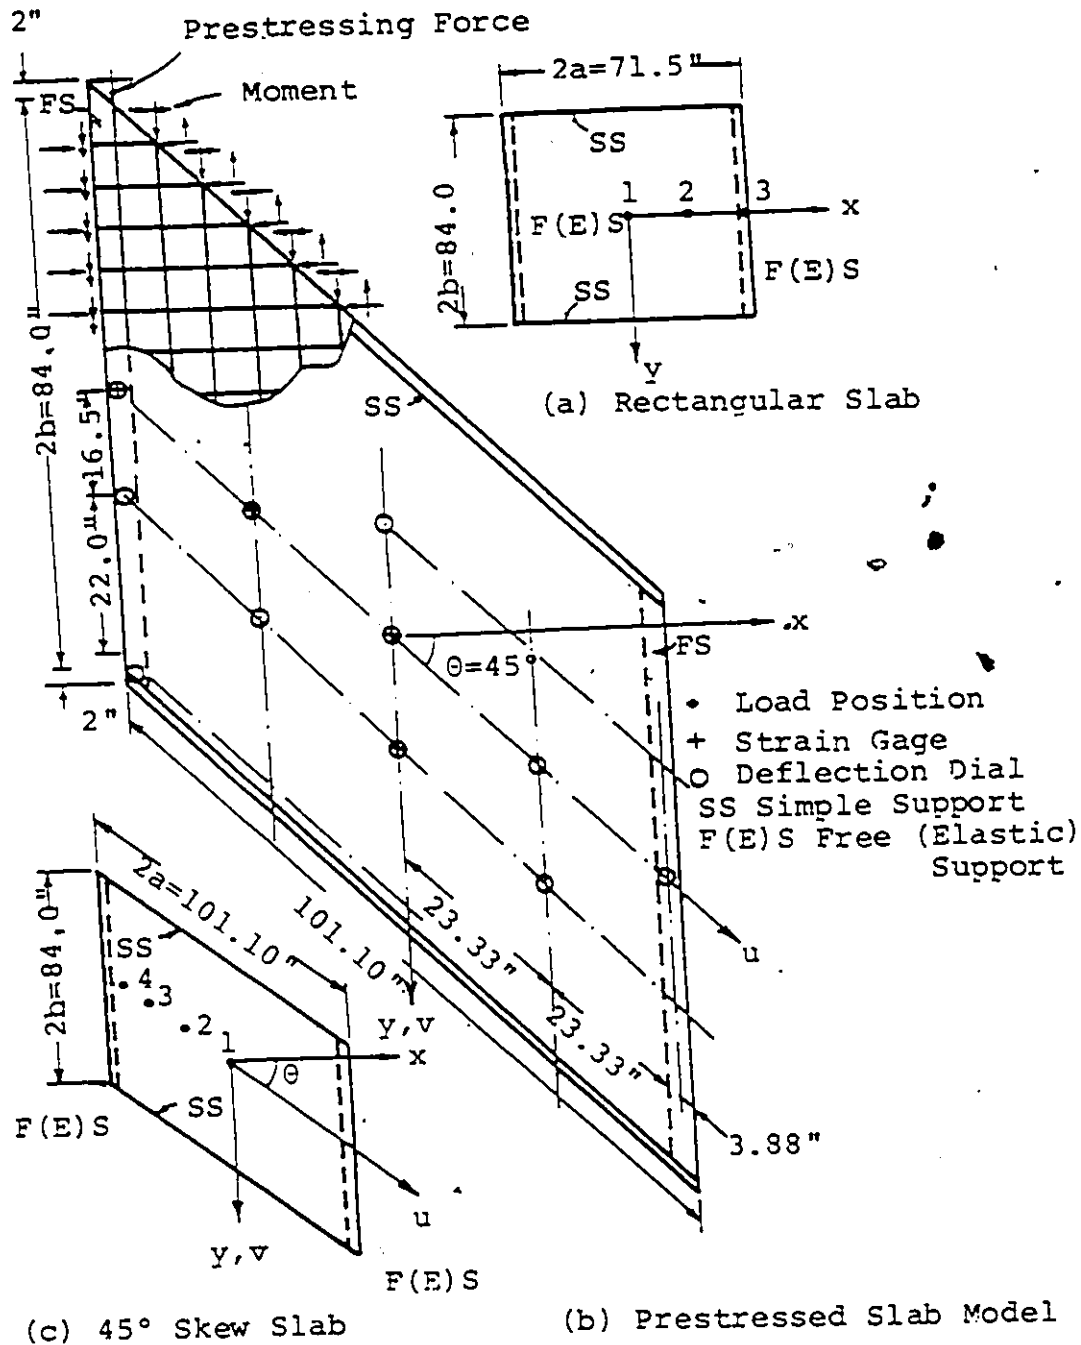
PLANFORMS OF PRESTRESSED CONCRETE WAFFLE SLAB BRIDGE MODELS (1 inch = 25.4 mm)
